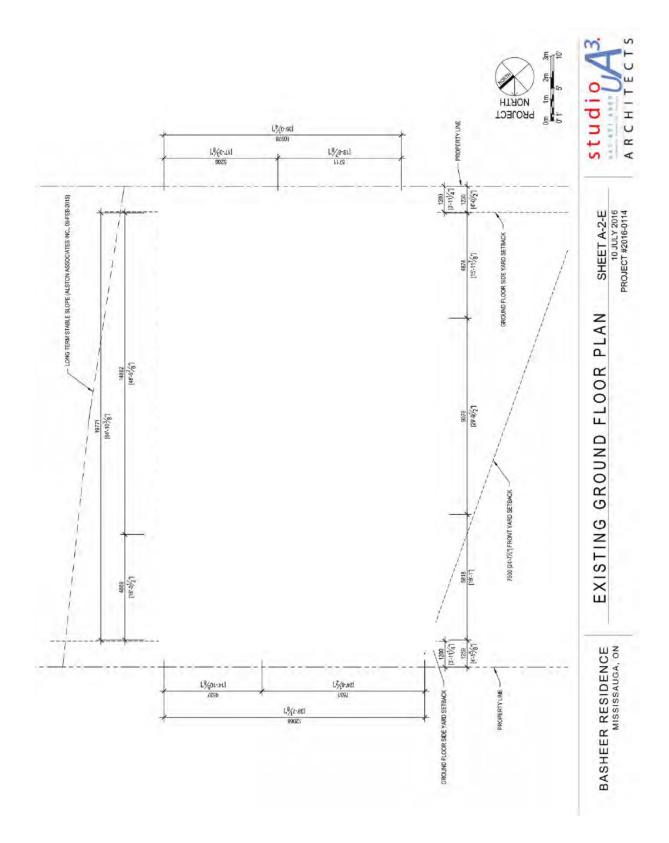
23 Plainsman Road - Existing Ground Floor Plan
